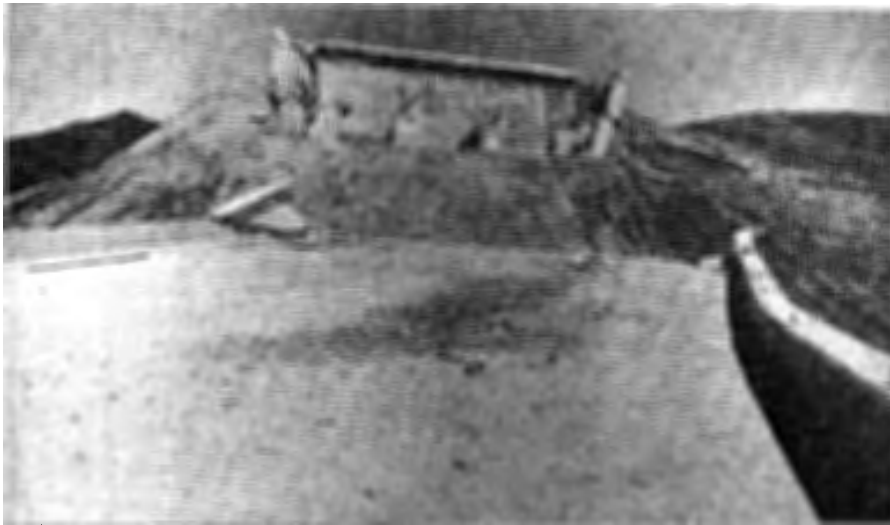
Route 5/210 Separation and Overhead bridge. Abutment 8 (north abutment). Note shattered wingwall due to lateral battering action of bridge superstructure. California Division of Highways, Bridge Department photograph.
